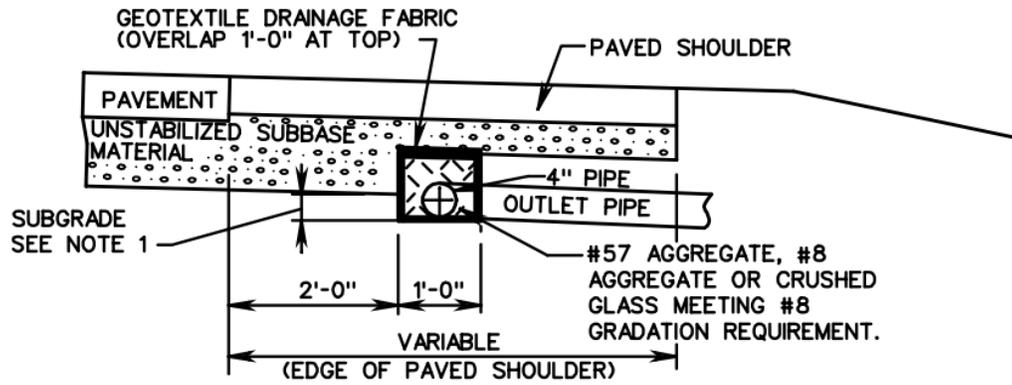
VDOT standard pavement UD-4 underdrain detail (Not to Scale)
